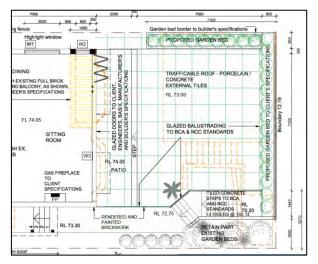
Approved ground floor plan under DA-103/2021 at 45 Military Road.
